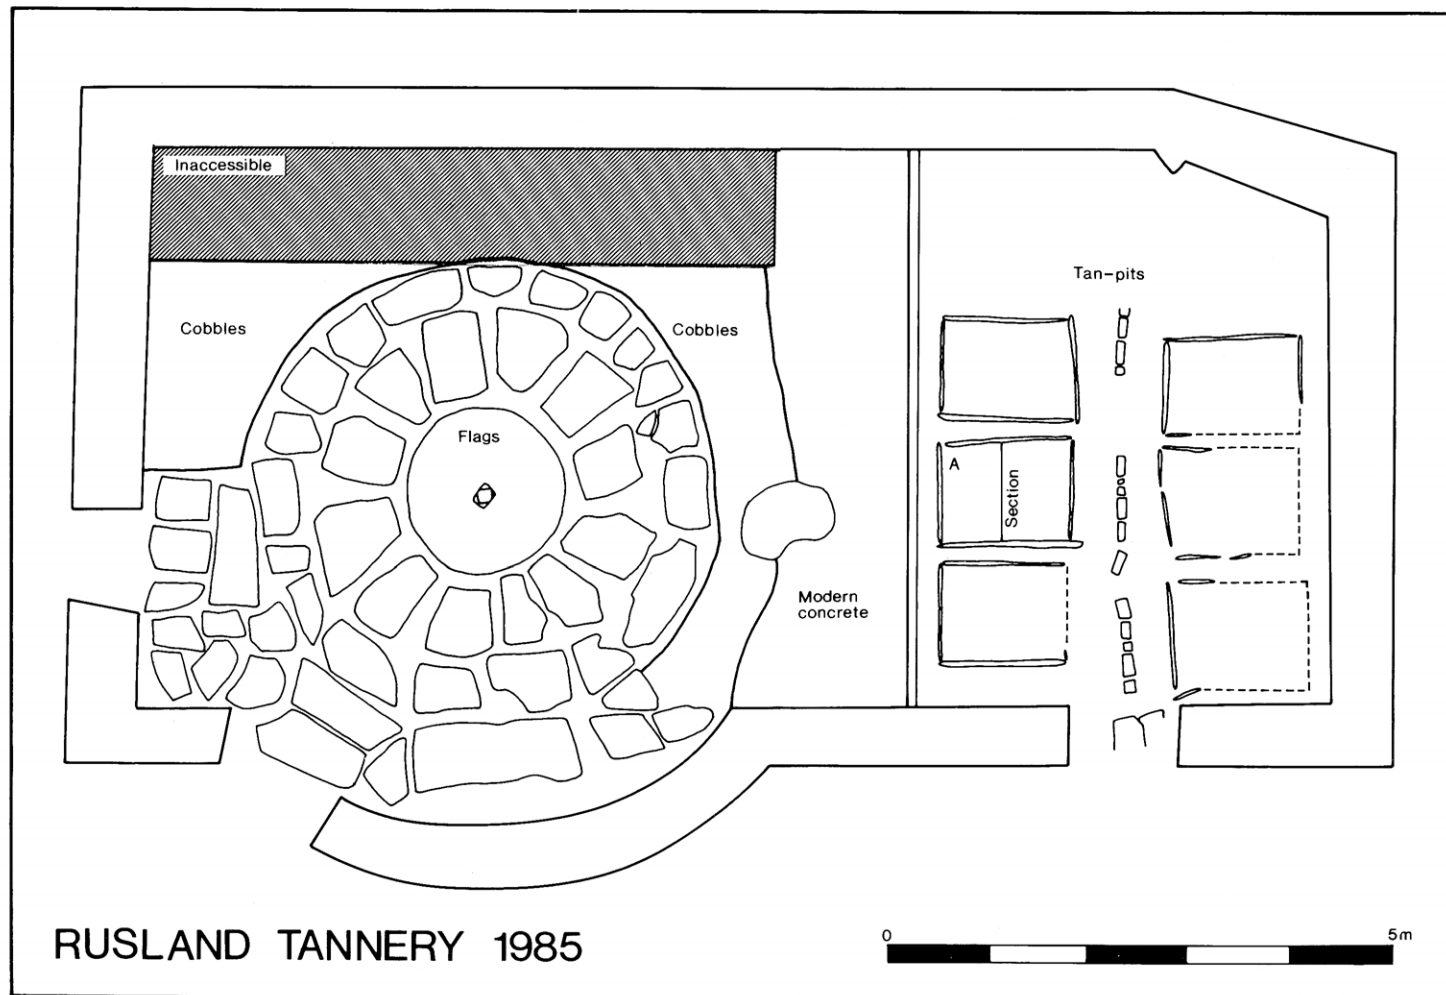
Floor plan of the Phase I building shows the later flagged floor and the six slate-sided tan-pits.
